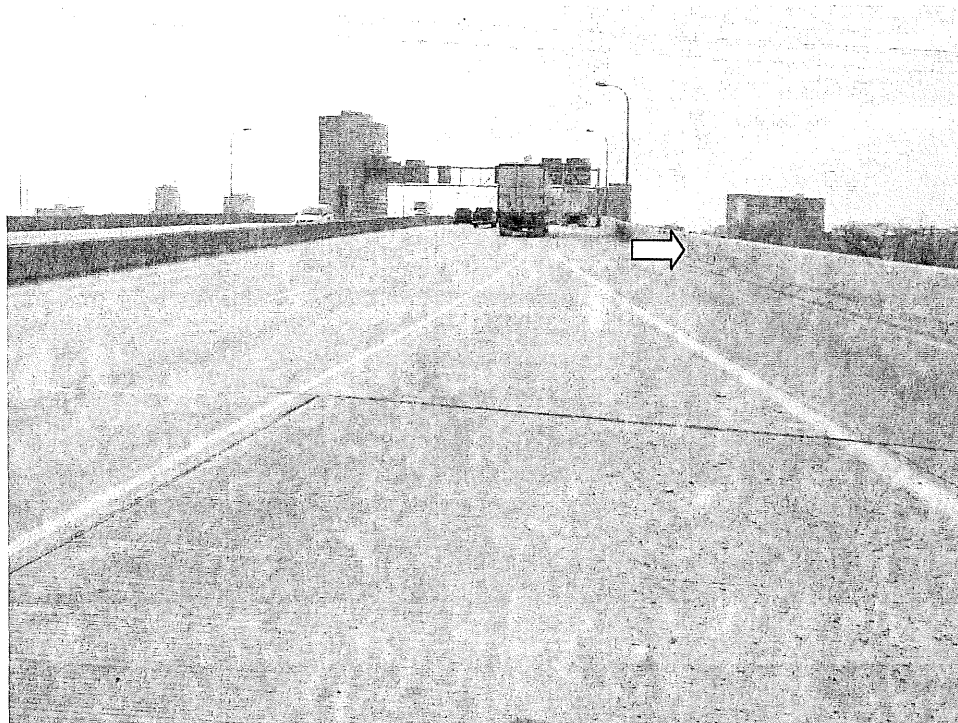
Modified barrier rail with new concrete facing shown on right.
